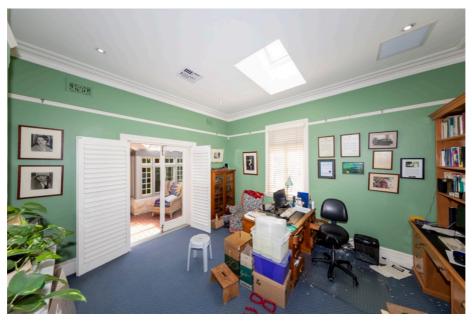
3<sup>rd</sup> room off front hallway, looking towards the enclosed front verandah. Note skylights to the ceiling and modern glazed doors onto the front verandah.
